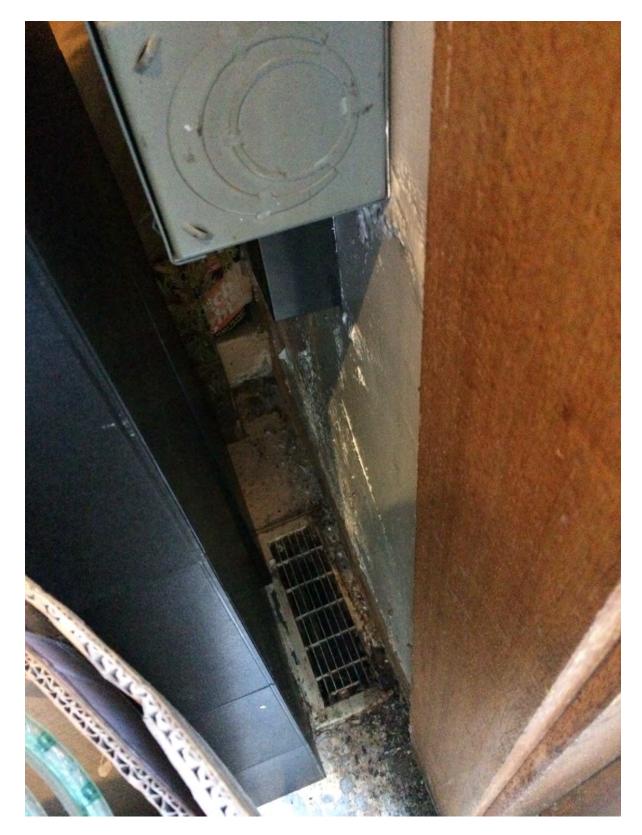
Condition at Choir wall interior. Photo by Prudon & Partners.
